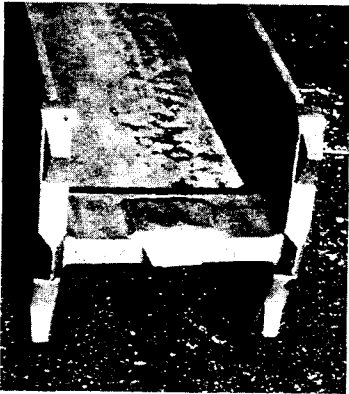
Hardened steel point attached to the toe of a steel H-pile to protect it during hard driving. (Associated Pile and Fitting Corp.)
